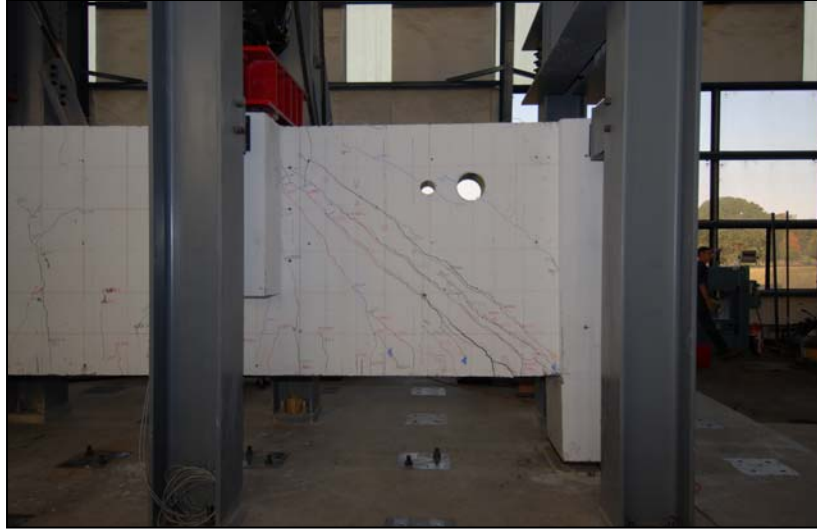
Typical diagonal crack forming at column bent connection roller side reaction
